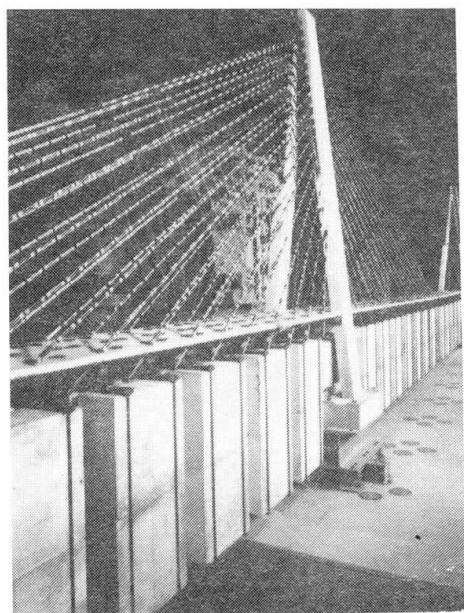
Large model test for cable-stayed bridges with slender concrete decks
